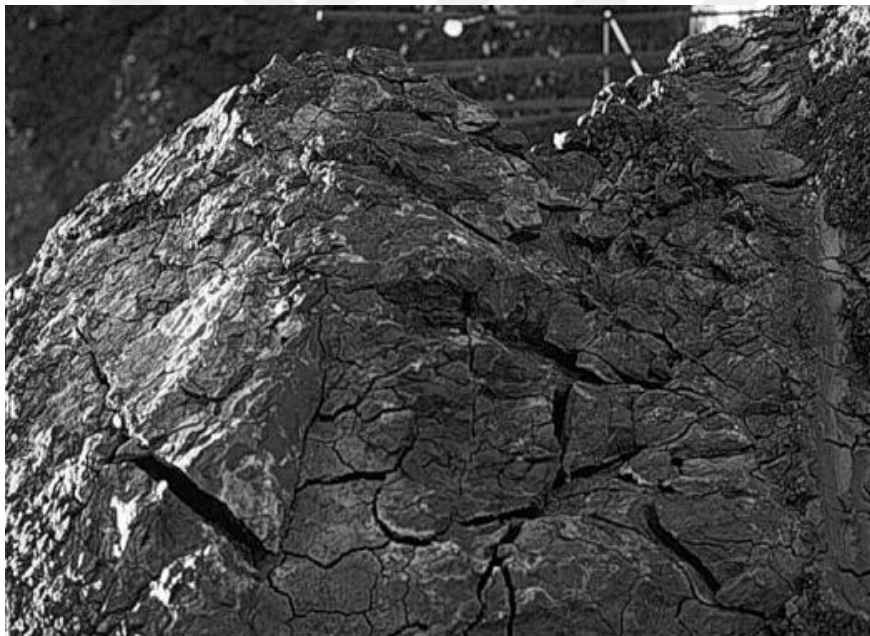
Interconnected shrinkage cracks extend from the ground surface into the active zone (Petry, 2000)
